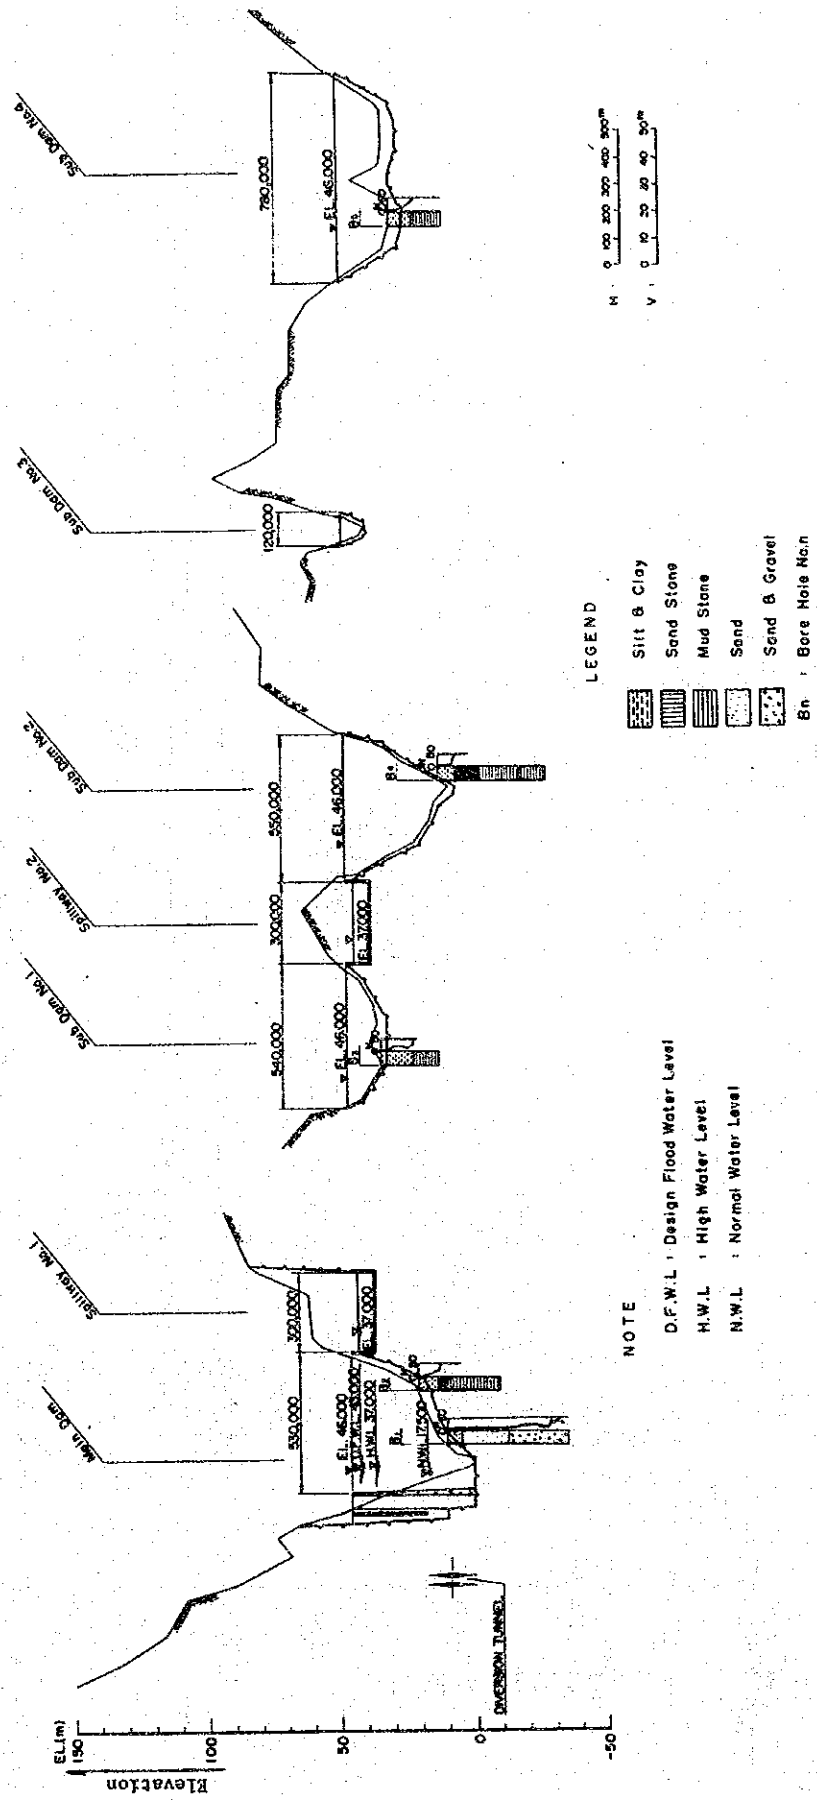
TYPICAL CROSS-SECTION OF DAM
